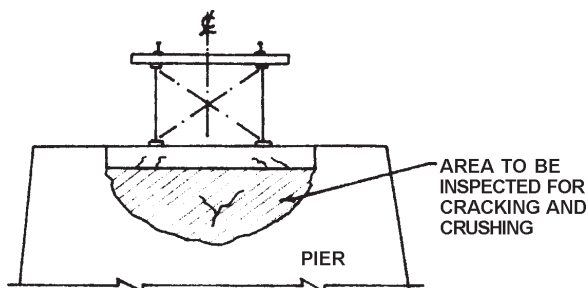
Cracks in bed block due to cracking and crushing of masonry under the bed block
